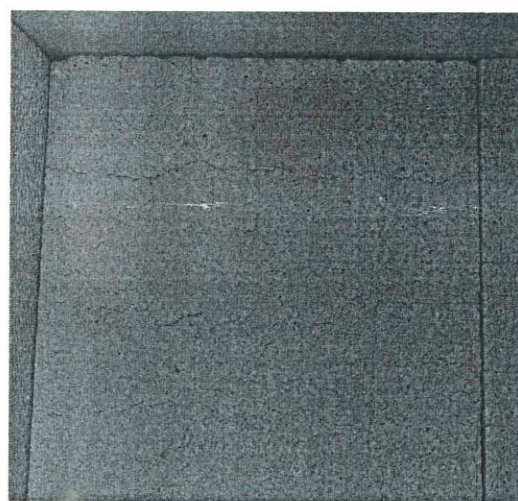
Section of the block wall showing cracks in the concrete blocks.
